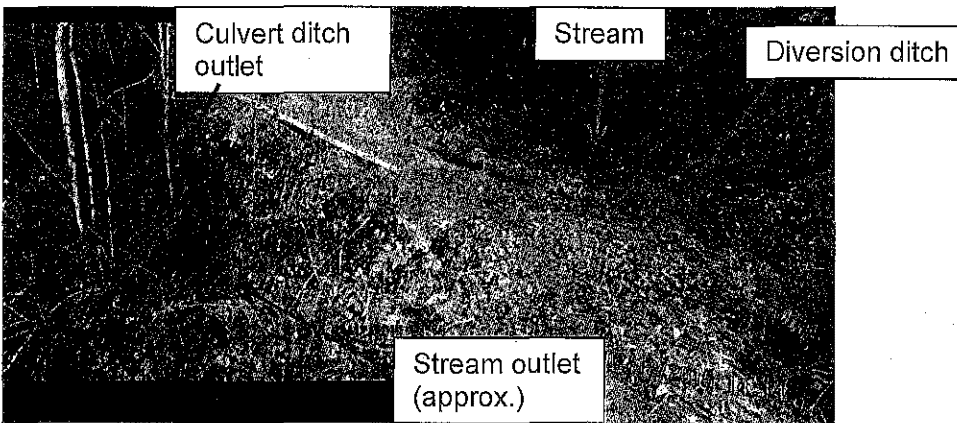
at Point 5, shows the shotgunned 12-inch ditch culvert outlet, diversion ditch and native stream channel flowing under the diversion ditch. (Photos 8442, 8443, 8444, 8445 composite)
